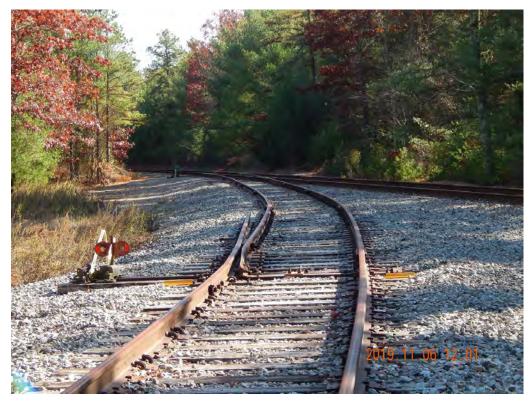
Industrial Spur at Second Potential Rail Transload Location Looking Southeast (2019)
